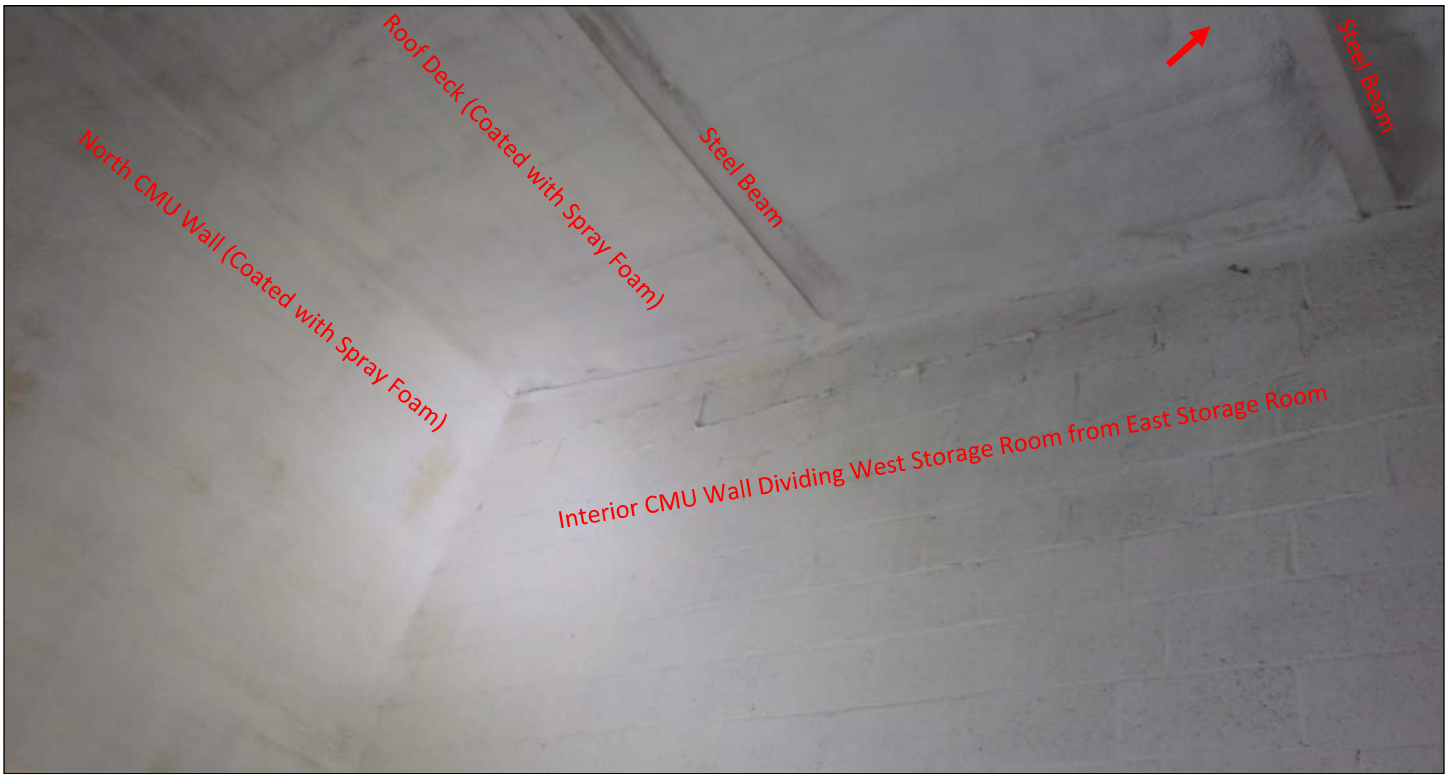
Overview of west storage room, looking up and to the northeast. Note moisture stains on roof deck and north CMU wall.
